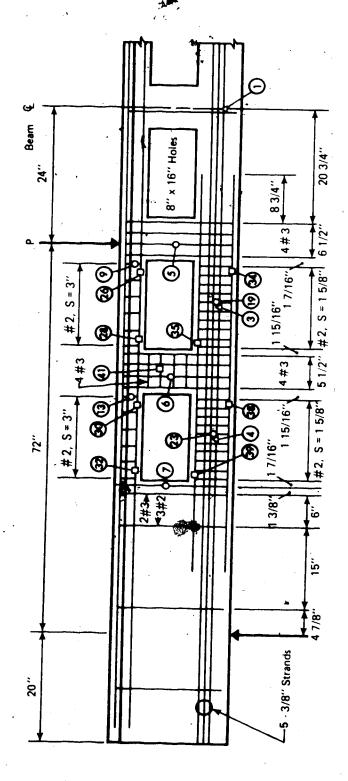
Reinforcement Details and Strain Gage Locations for Beam 25-16-6
